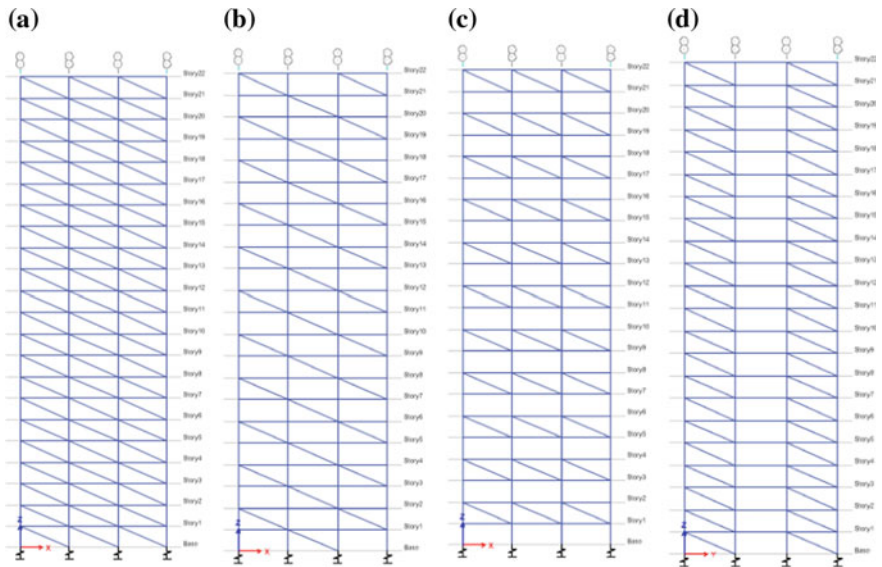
Elevation of 22 storey diagrid buildings with eccen backward bracing pattern arrangement (a whole, b alternate, c horizontal, d vertical)
